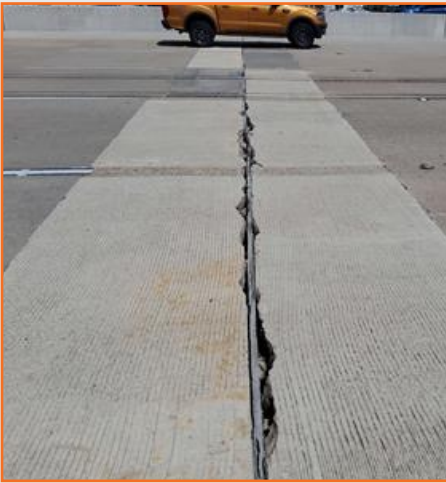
SRT concrete pavement joint deterioration NBML north of Old Denton Rd.
